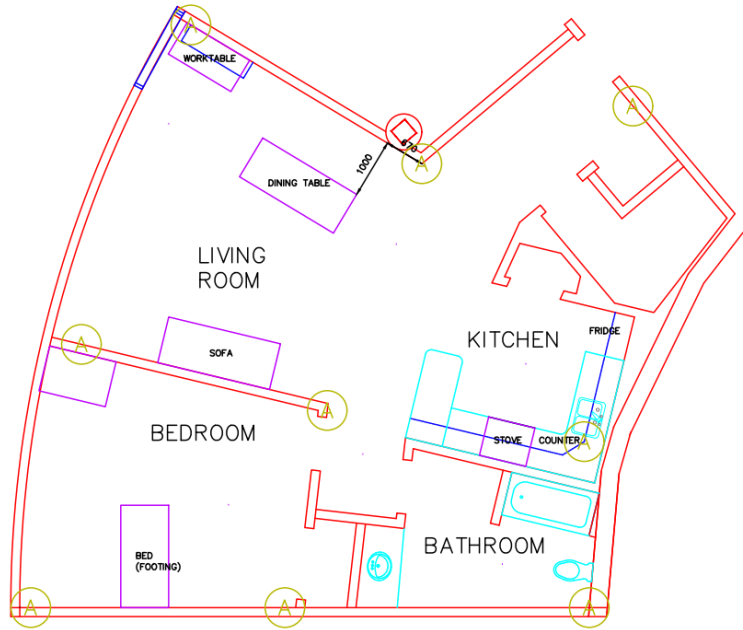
ILS Floorplan with the 9 anchors all high.
